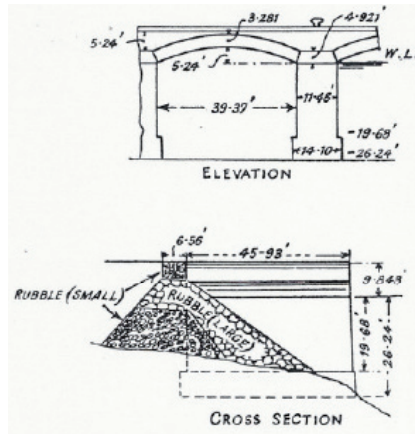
Cross-section and front view of quay wall port of Naples 1921 [Duplat Taylor 1949]
